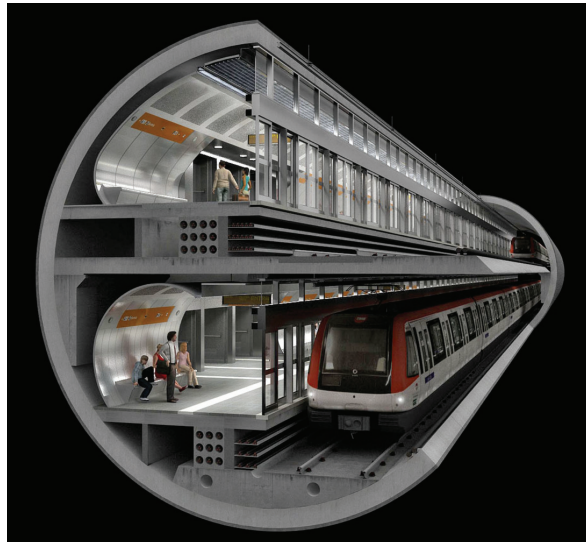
A cross-section of the double-deck tunnel with platforms in L9 [1].
